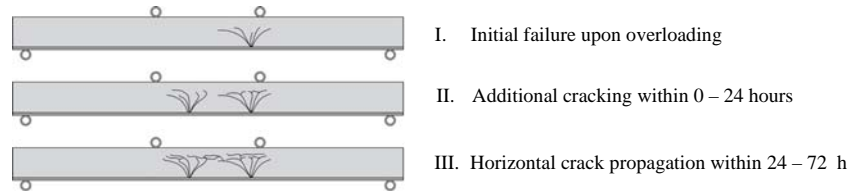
Crack development in acrylate-2 beam specimens under static load.
